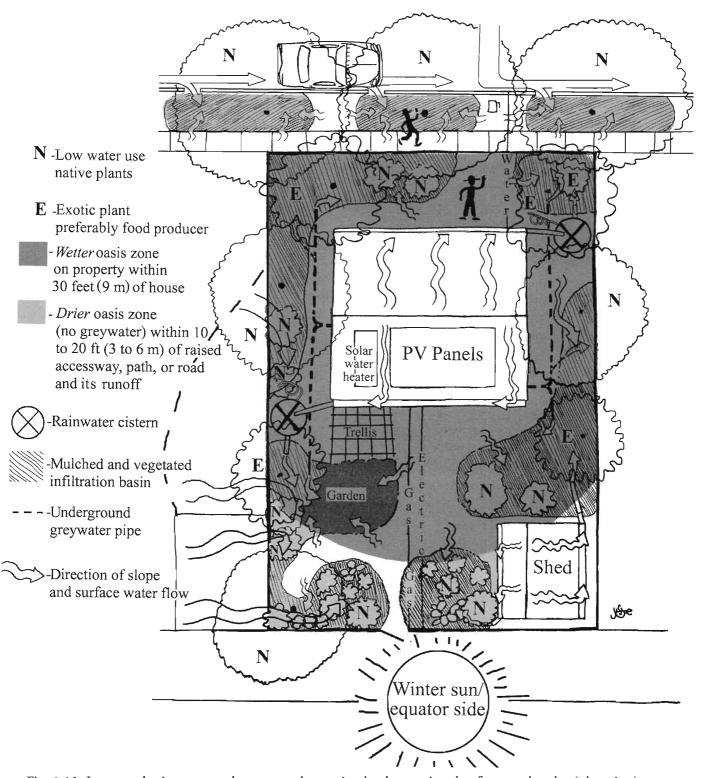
Integrated rainwater- and greywater-harvesting landscape site plan for an urban lot (plan view). Higher water-use plants (typically exotic fruit trees or larger native plants) are planted inside the wetter oasis zone, receiving roof and hardscape runoff and household greywater. Here vegetation passively shades and cools the home and people, produces food, gives beauty, and provides other benefits. Only lower water-use plants—ideally natives—are planted beyond the wetter oasis zone. Compare to the similar figure in Volume 1, chapter 4, to see how this site's integrated design works with the resources and challenges of sun, noise, wind, neighbors, and more.
